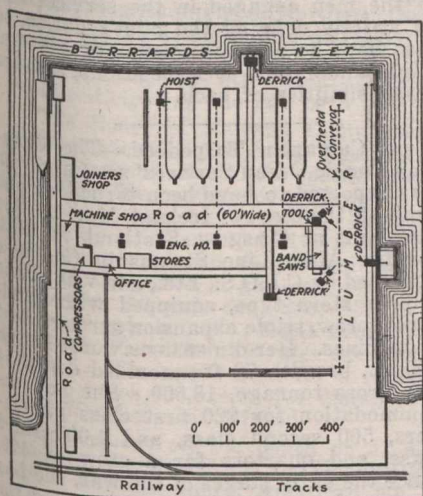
Wm. Lyall Shipbuilding Co.'s yards at West Vancouver.
